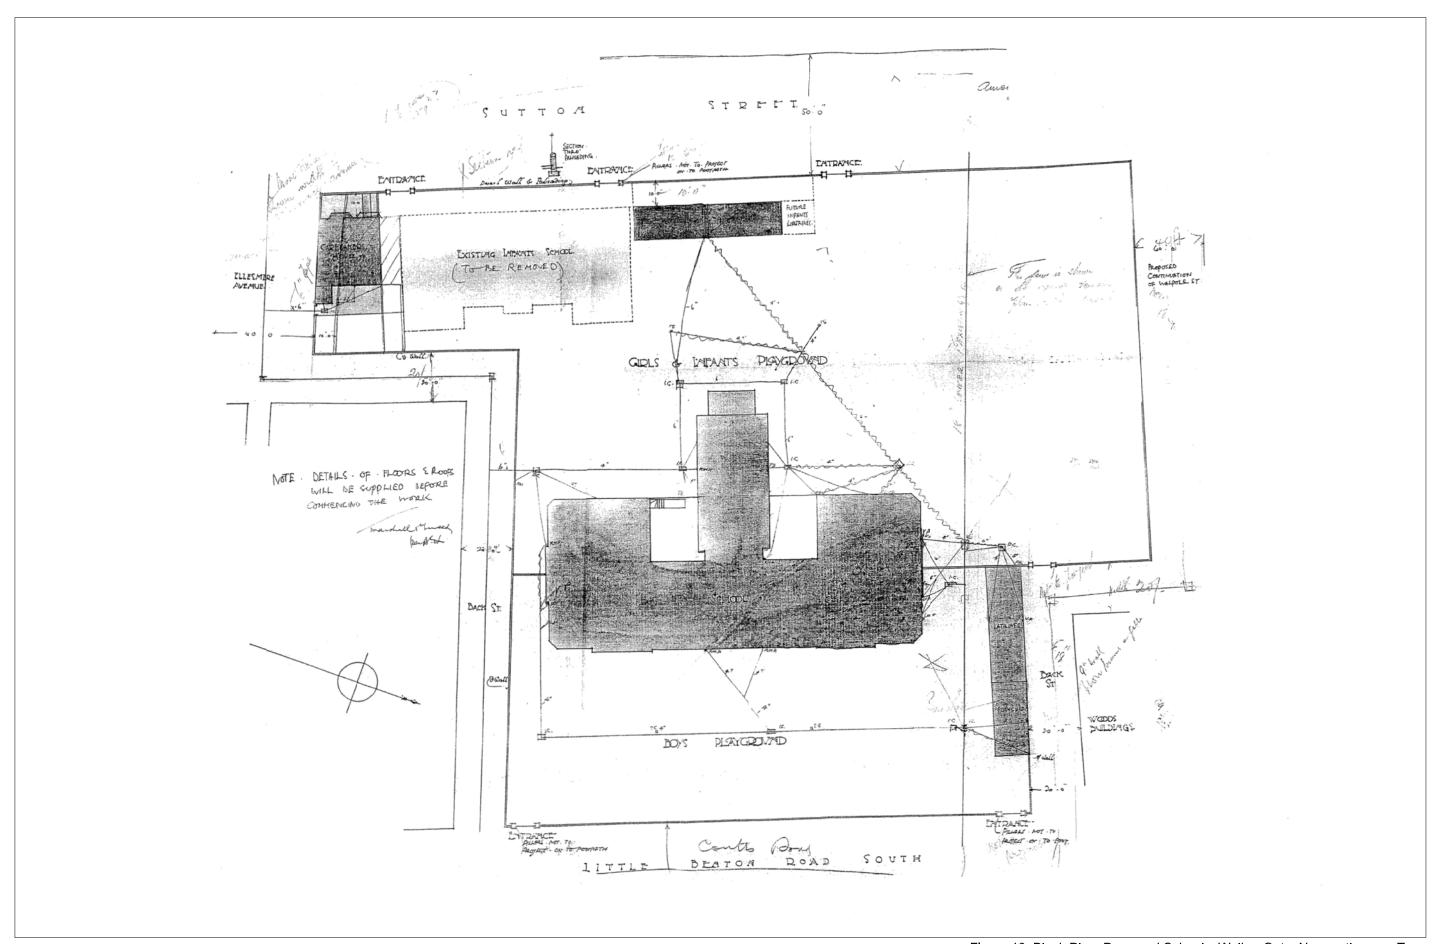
Block Plan. Proposed Schools, Walker Gate, Newcastle-upon-Tyne March 1912, Marshall and Tweedy Architects for the Newcastle-upon-Tyne Education Committee Original scale: 16 feet to 1 inch
